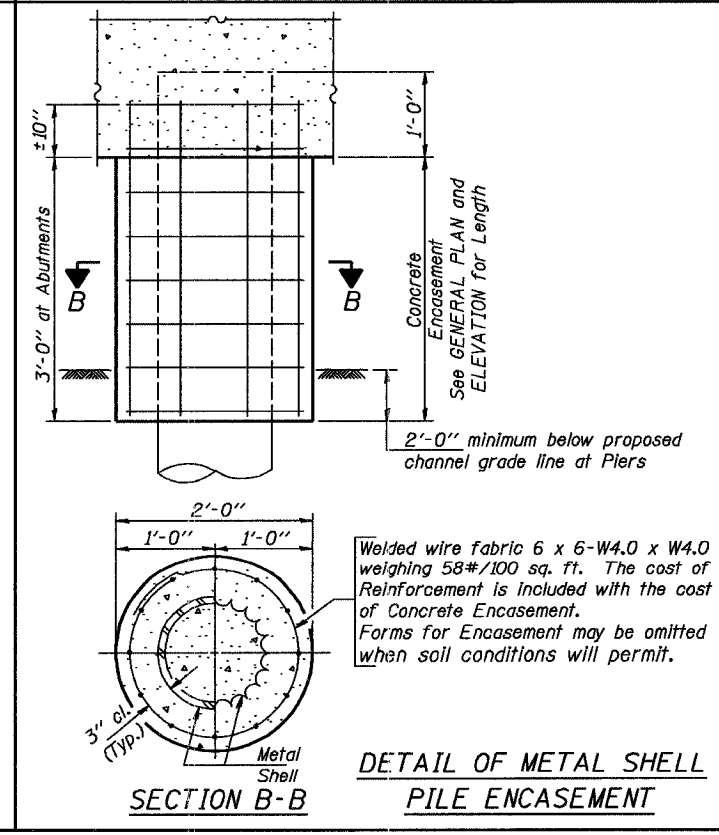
DETAIL OF CYLINDRICAL STEEL SHELL FOR CAST IN PLACE CONCRETE PILES
